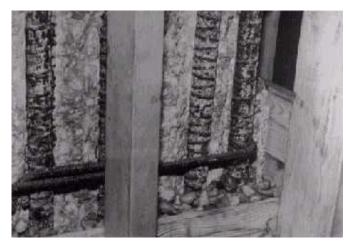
After the existing concrete surface is prepared properly, the coarse aggregate is placed as the timber forms are erected
